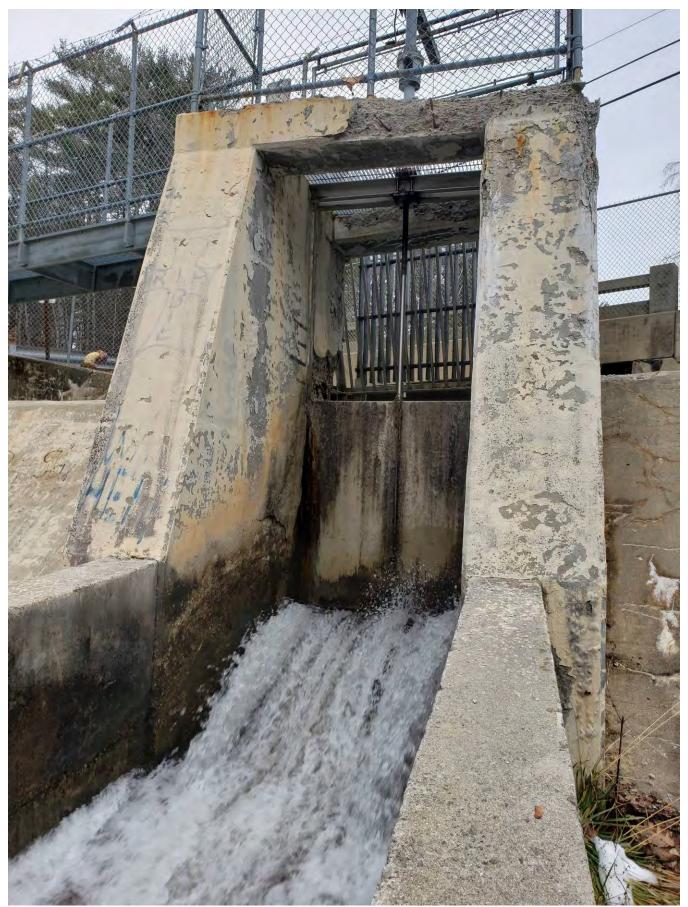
SLUICEWAY VERTICAL LIFT GATE AND CONCRETE DEGRADATION.
